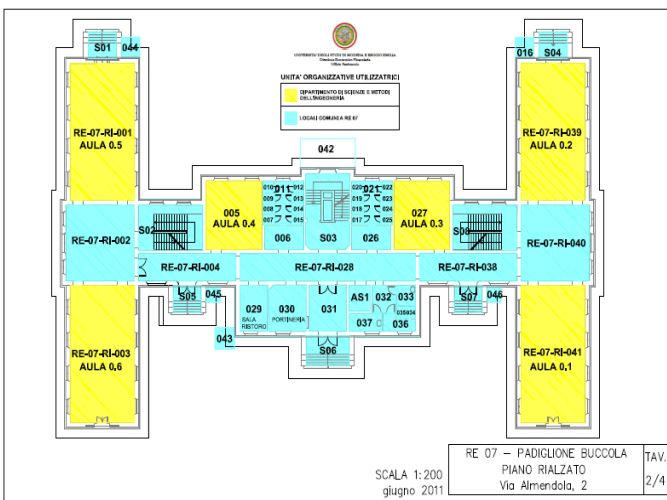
Buccola pavilion. Raised ground floor plan. UNIMORE technical document.
